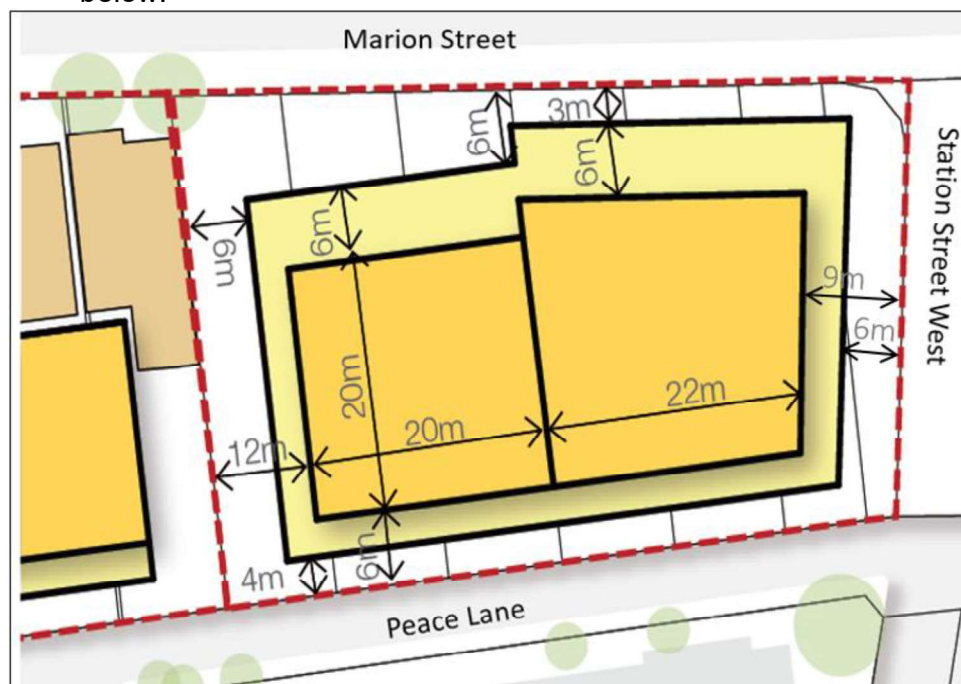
Podium and tower setbacks in the draft site-specific Development Control Plan
